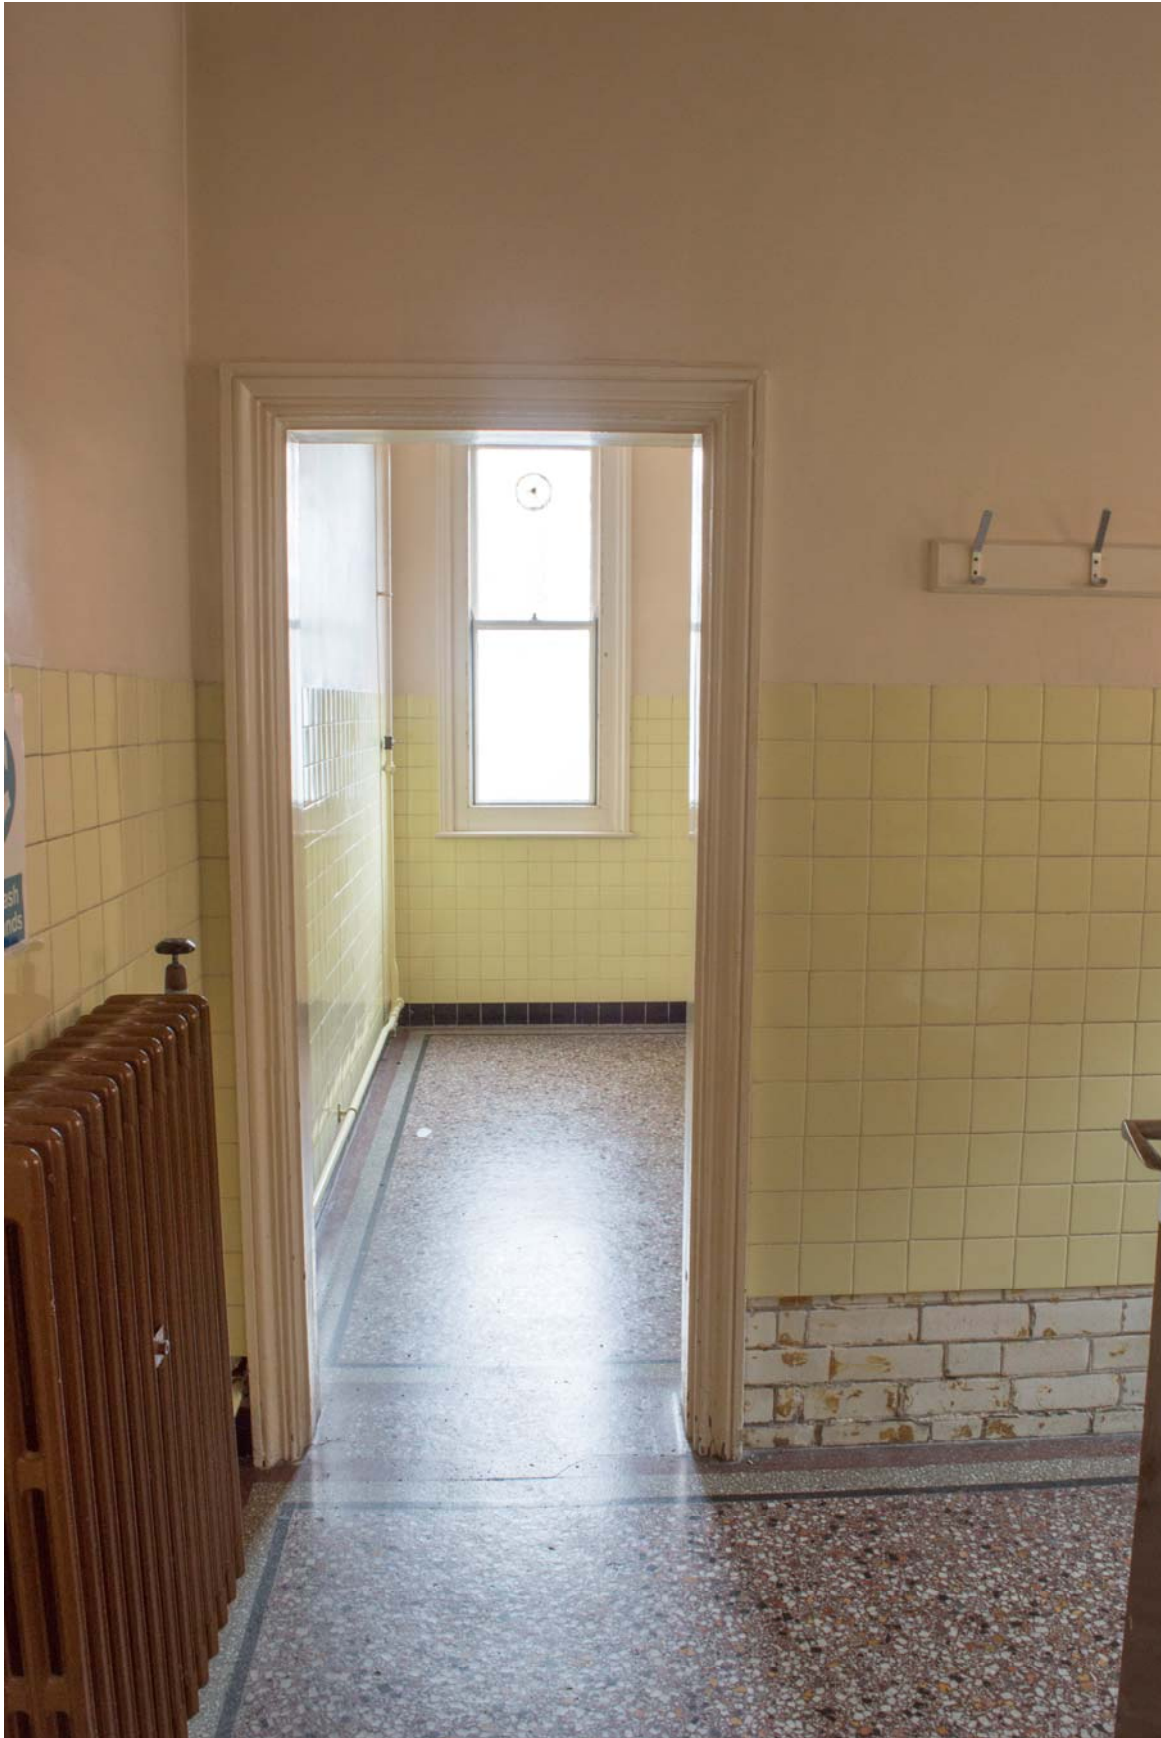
Building 20: ground floor, main WC. Note the original tiles to the base of the wall, and the terrazzo floor. View looking north (SGA15-452)
